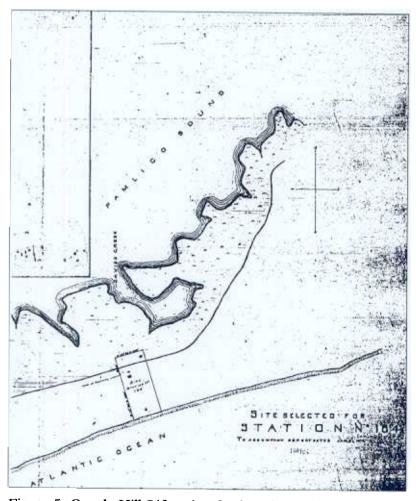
Creeds Hill Lifesaving Station site within rectangle at lower left, as drawn in January 1917, with boathouse at ocean, station house and messroom at road, and stable near sound (Source: Coast Guard Academy Library)
